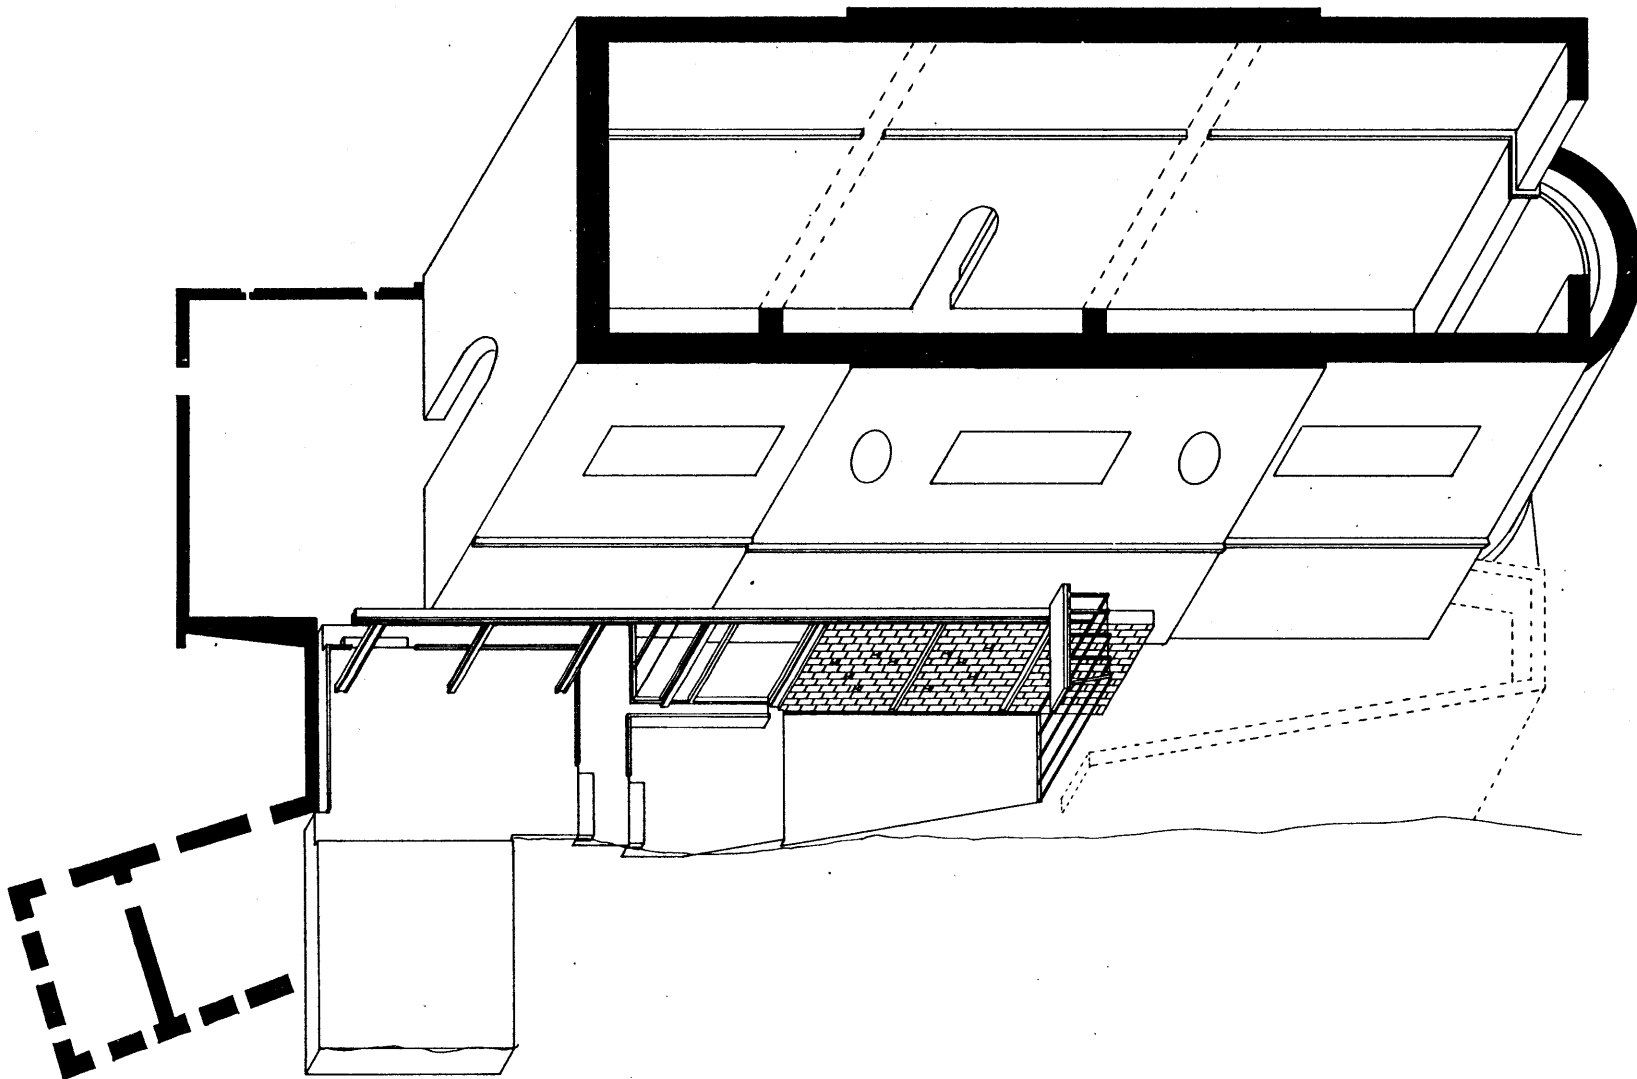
Axonometric showing relationship of column to basilica wall and level changes.
